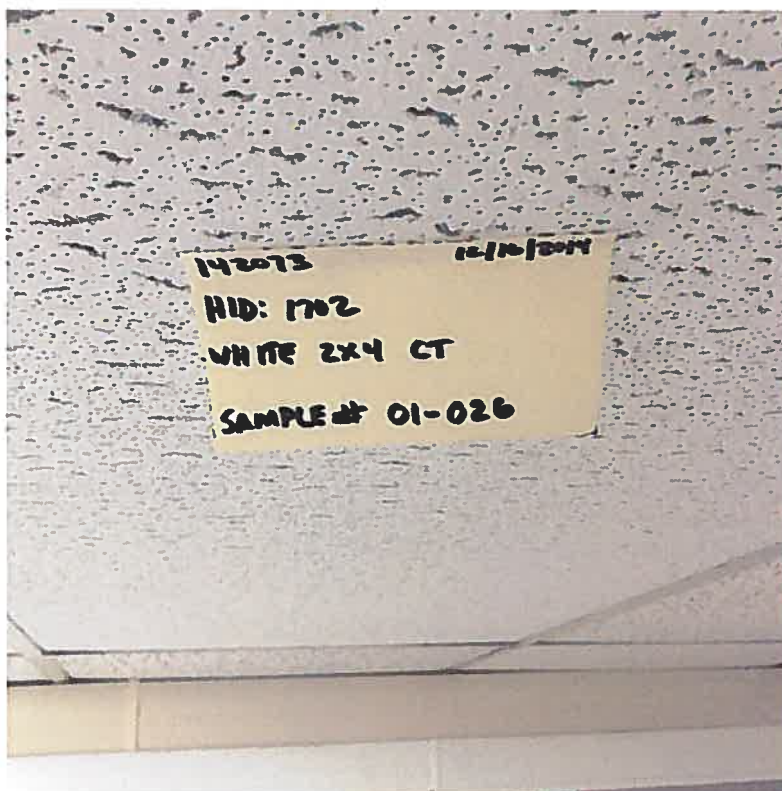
HID#1702 – White 2'x4' Ceiling Tile
